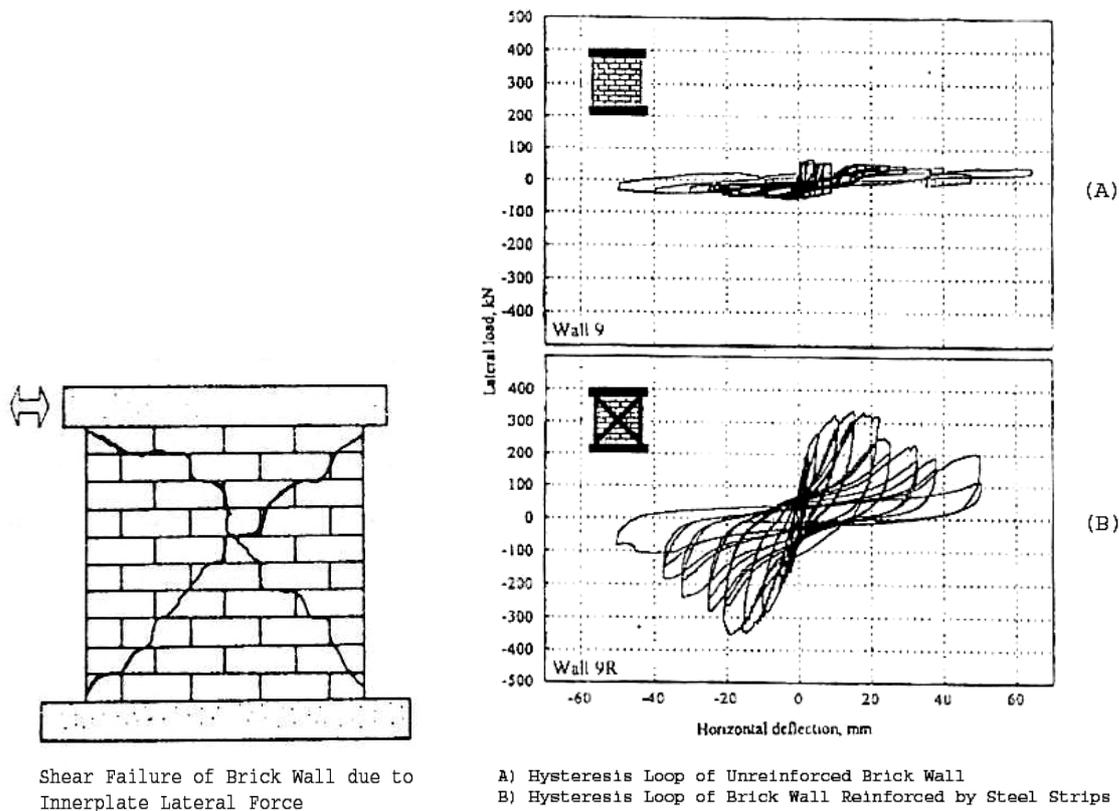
Behavior of masonry wall and effect of strengthening by adding bracing
